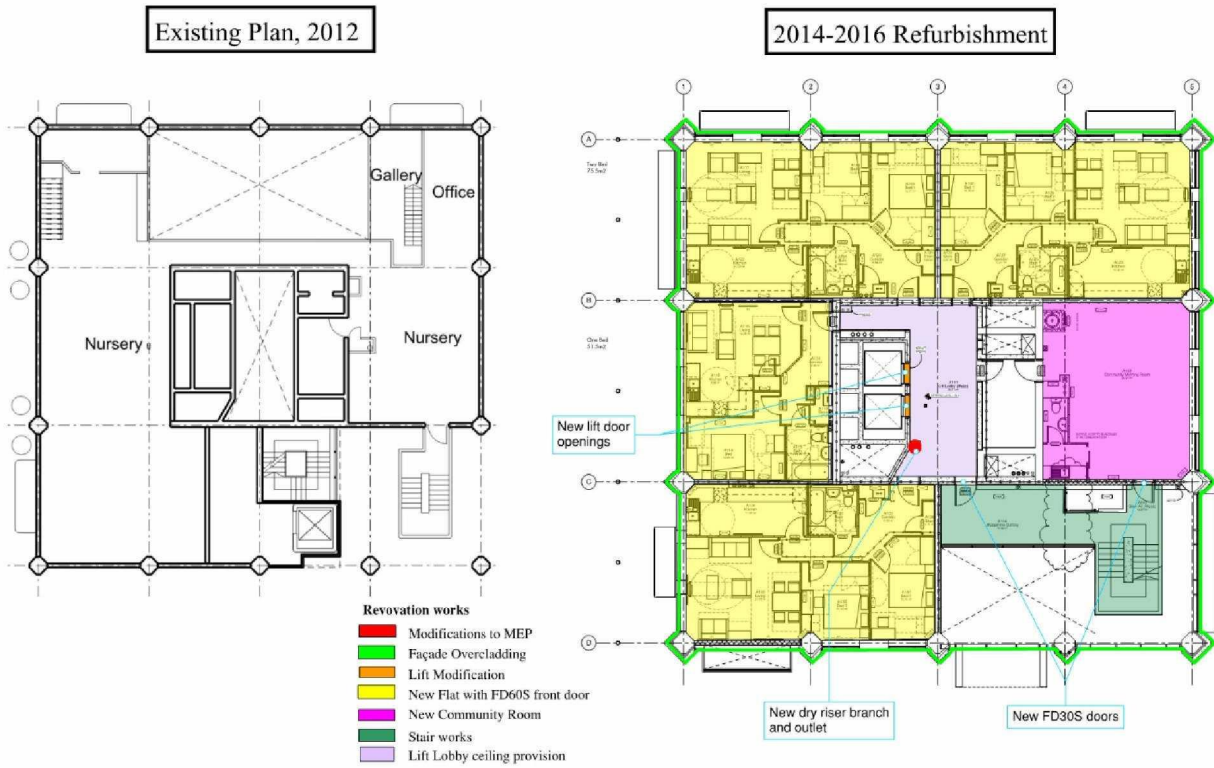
Level 1 – refurbishment plan and existing 2012 plan (MAX00000879, SEA00003231)
